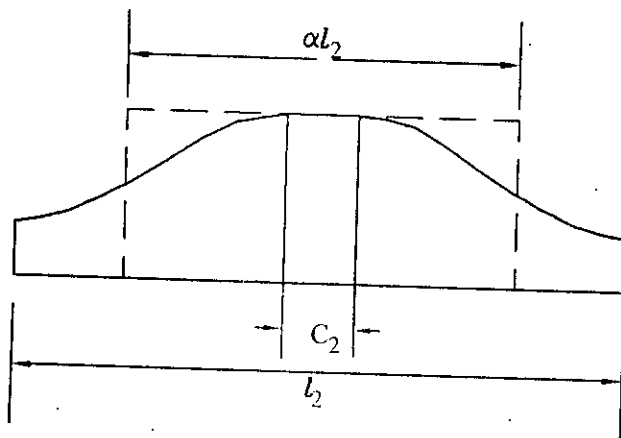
Effective Slab Strip Ratio and Beam Width
